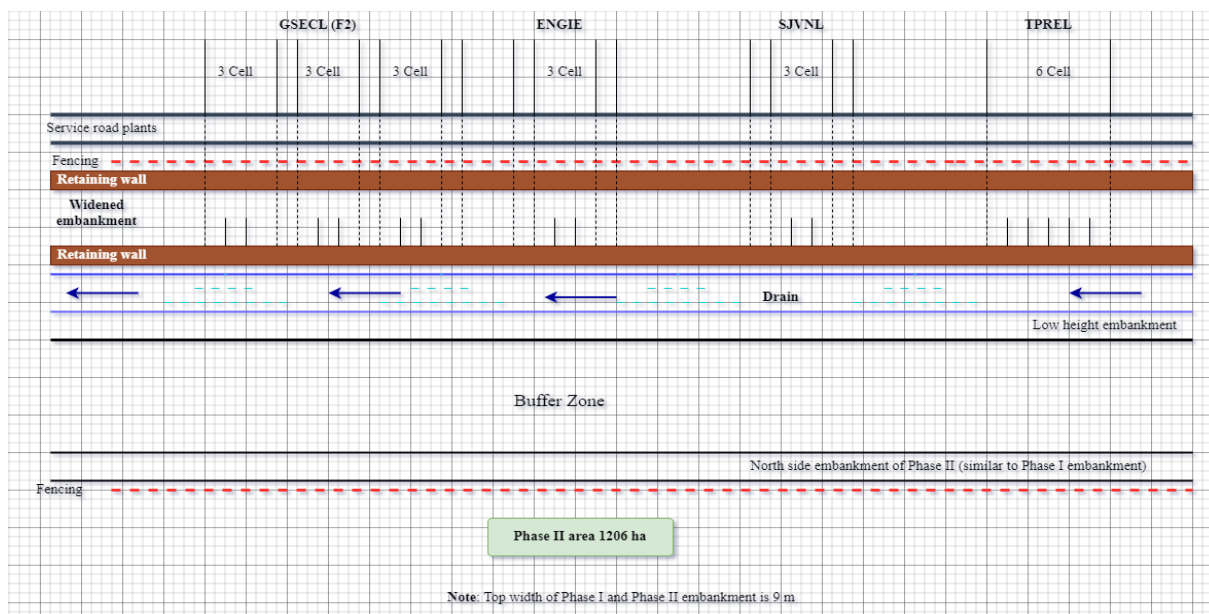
Plan view of phase I box culverts, embankment, retaining walls, drain and buffer zone
